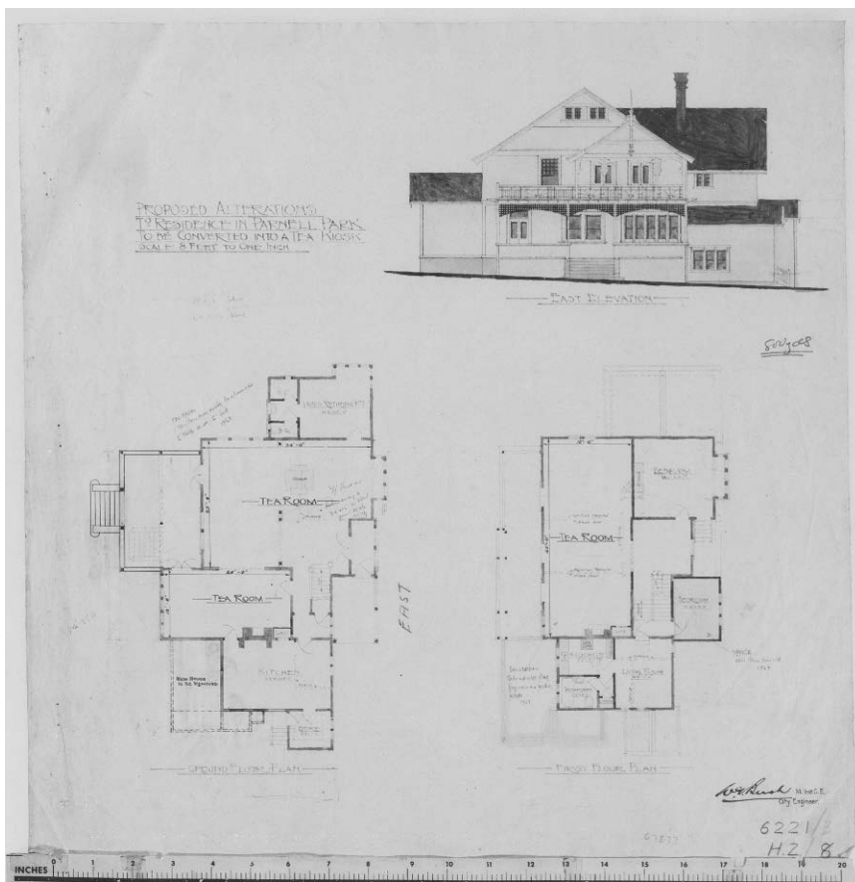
(above): Existing site plan, plans and front elevation of the subject building, prior to conversion into a Tea Kiosk.
